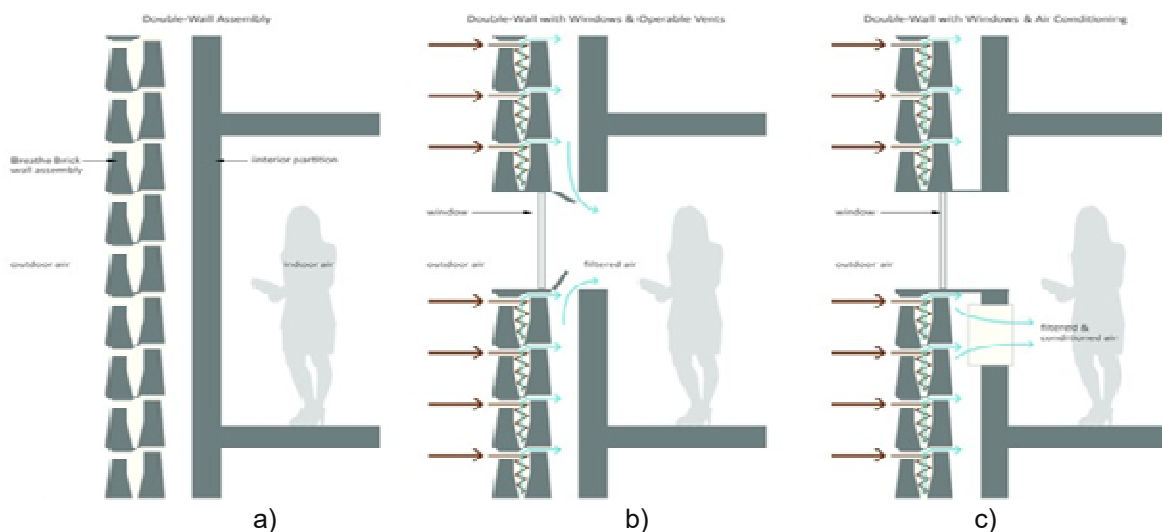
Possible configurations of Breathe Brick walls (Trudell, 2014)
